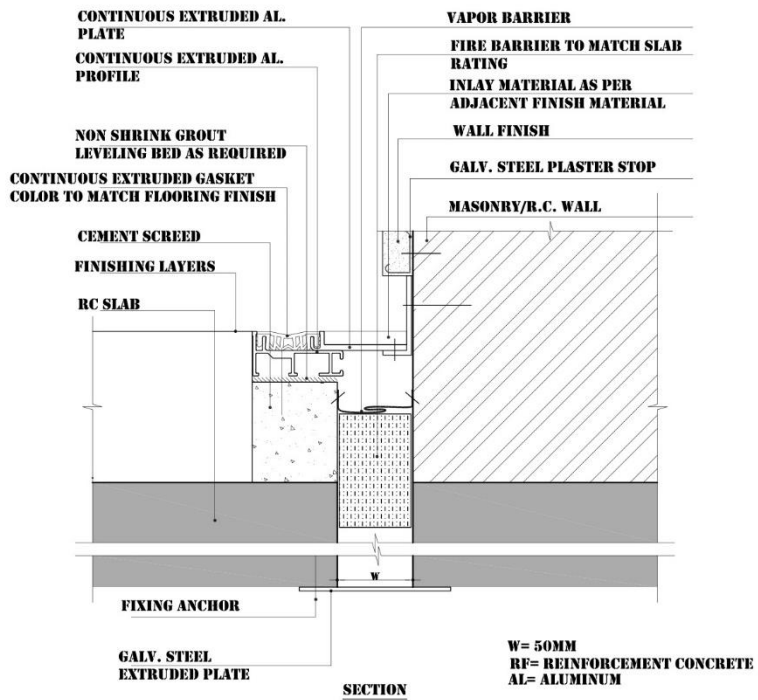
EXPANSION JOINT- PARTITION TO FLOOR
